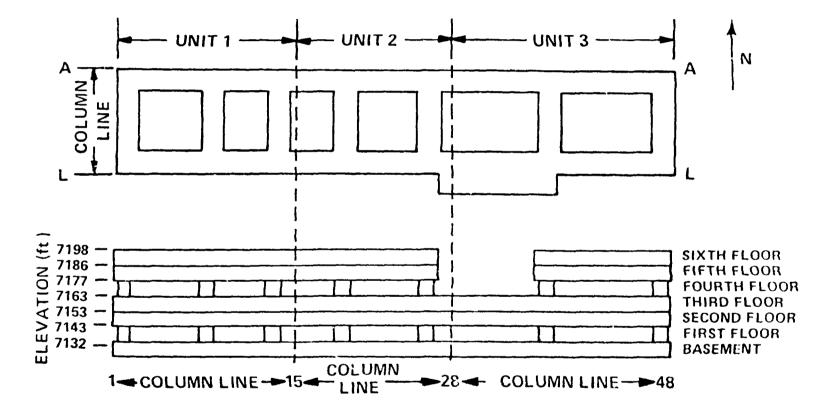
Architectural plan and elevation views of Vandenberg Hall.
